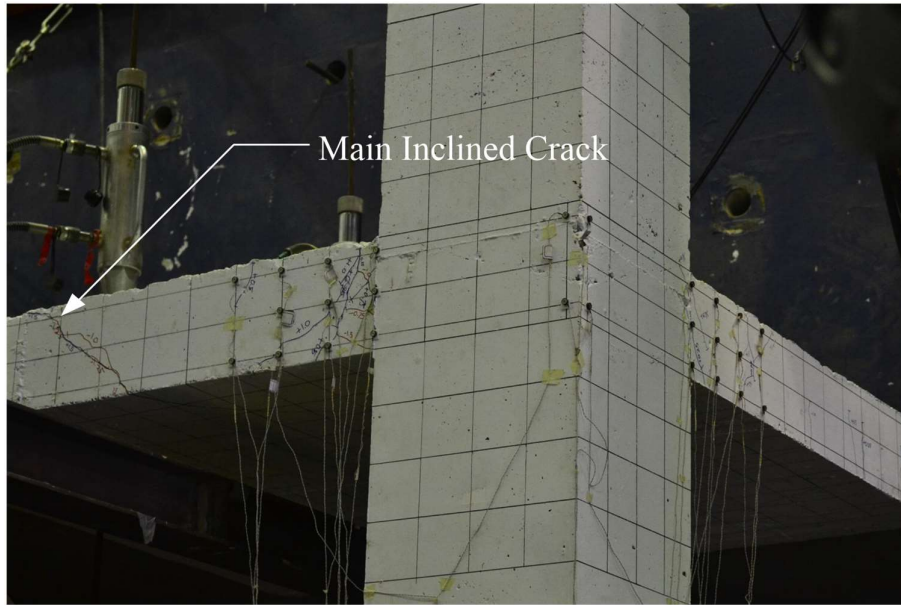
Crack Pattern on the North and West Slab Faces of Specimen R1 at 1.50% Drift
